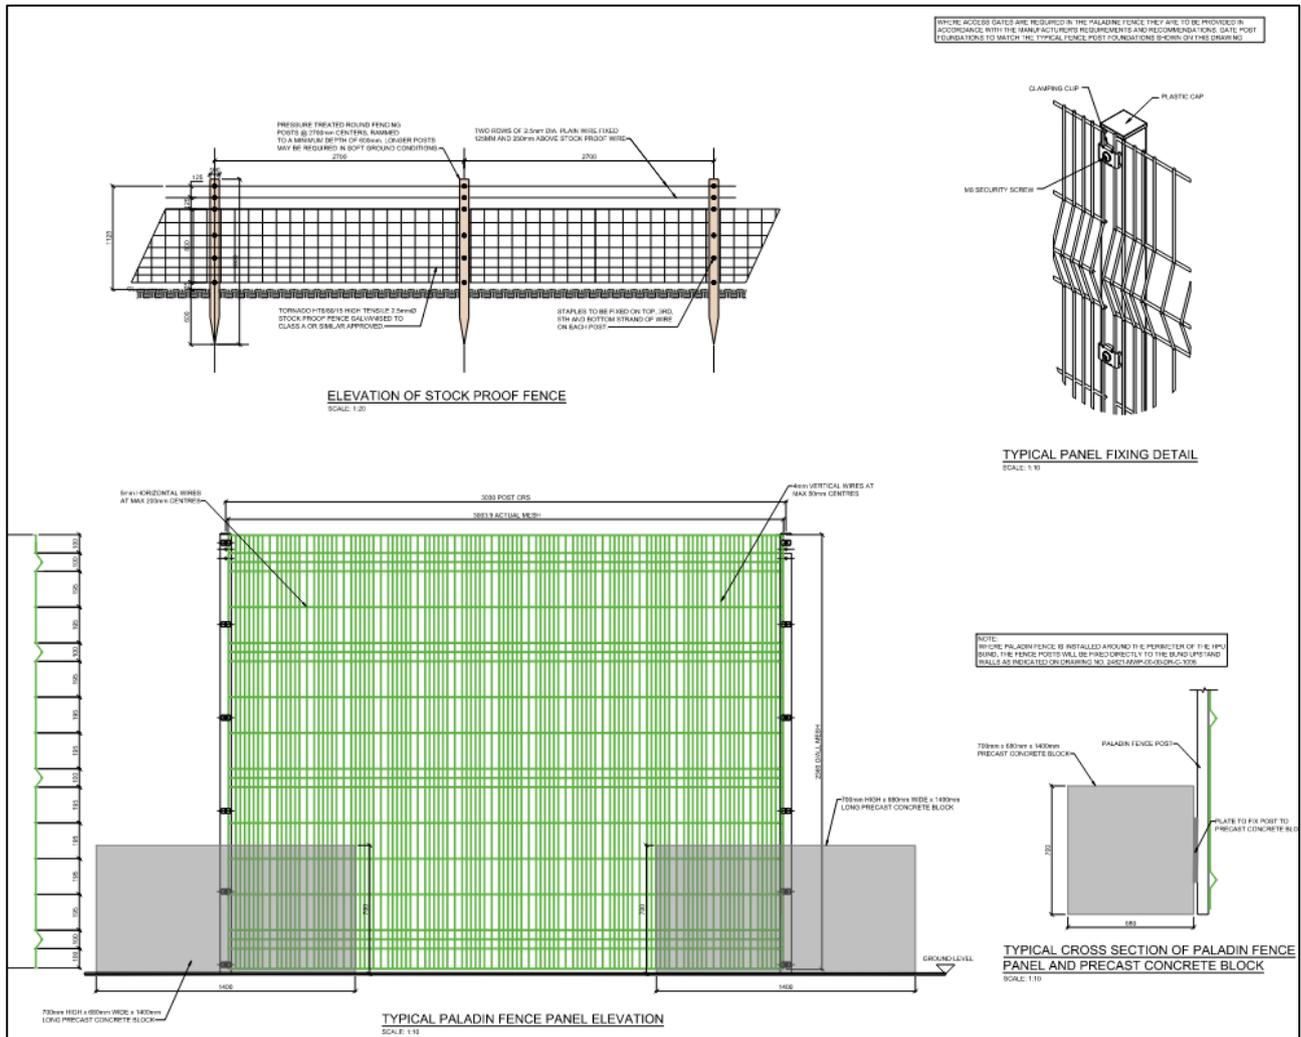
Design detail of paladin fence installation. Source Dwg. 24821-MWP-00-00-DR-C-0403 (MWP) | not to scale.
